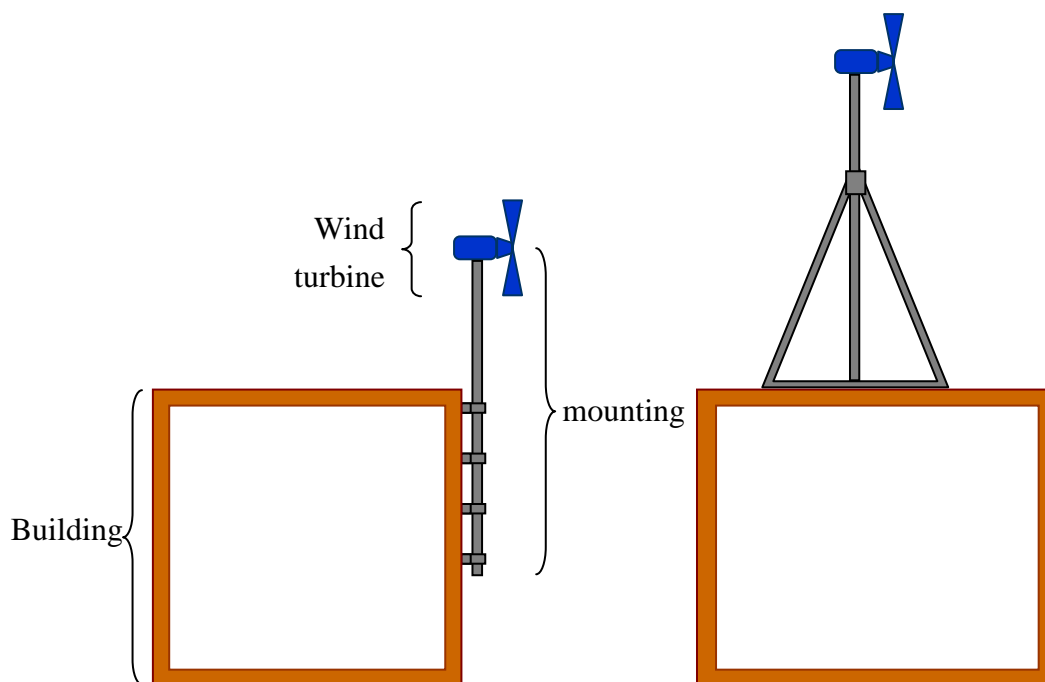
Schematic of installation showing WT (blue), mast (grey) and building (orange): left - wall mounted system; right - roof-mounted system.
